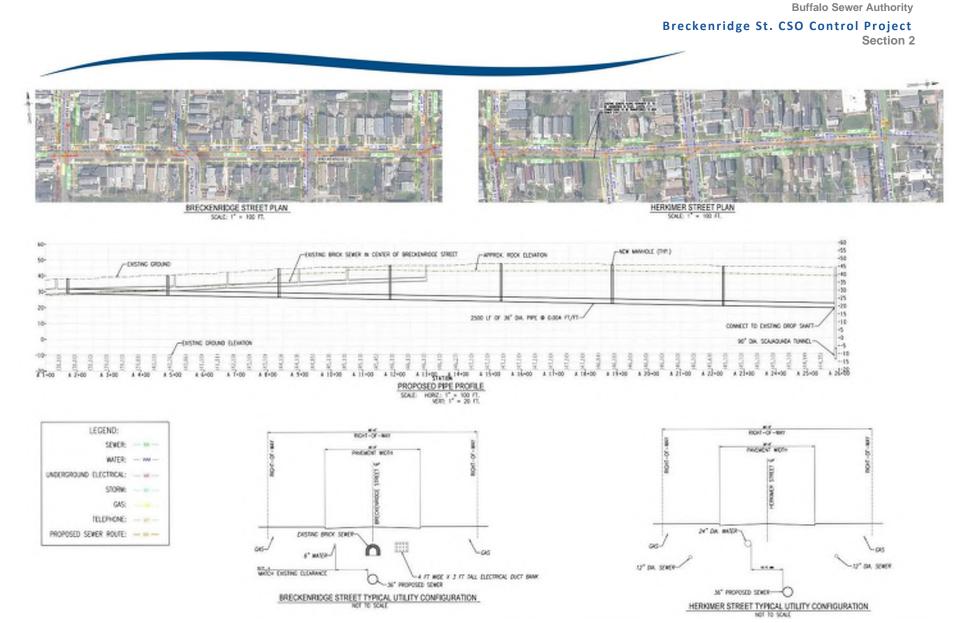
Proposed Route and Layout for Herkimer at Breckenridge and Lafayette
